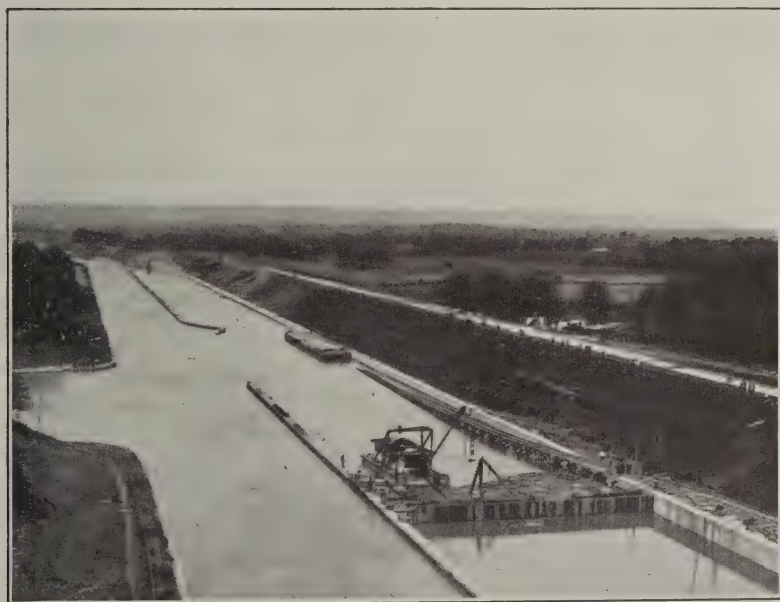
Break in Wall Coffers Midway of Canal. October 5, 1915.
